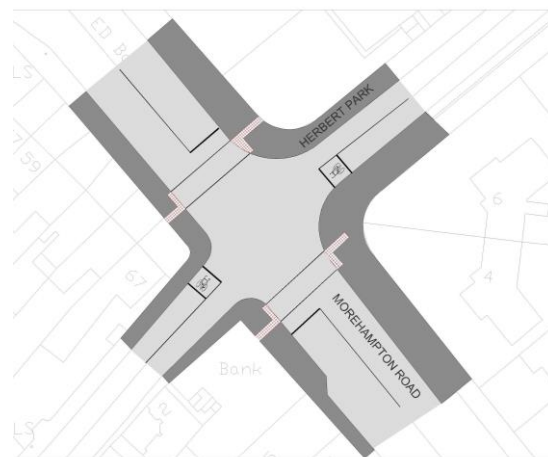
Herbert Park junction upgraded to provide crossing facilities
